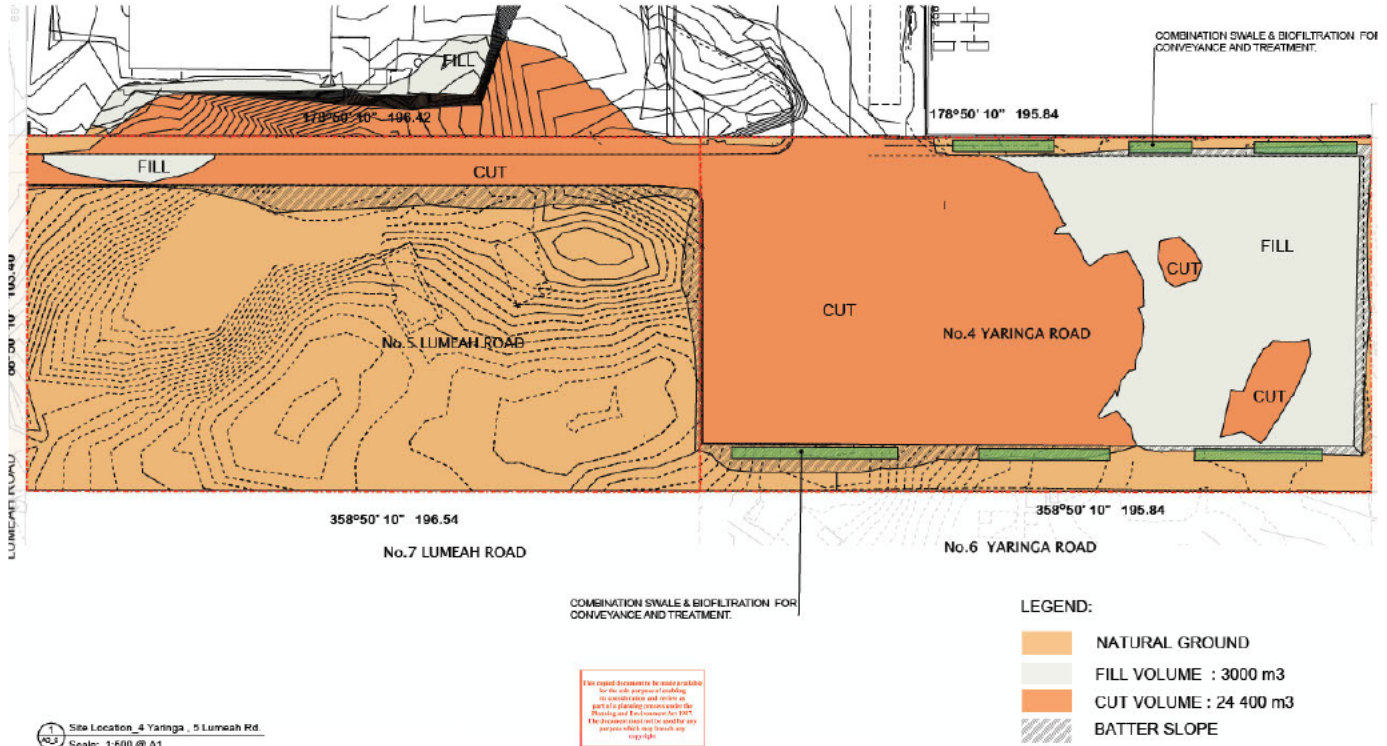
Proposed extent of earthworks at 5 Lumeah Road and 4 Yaringa Road
